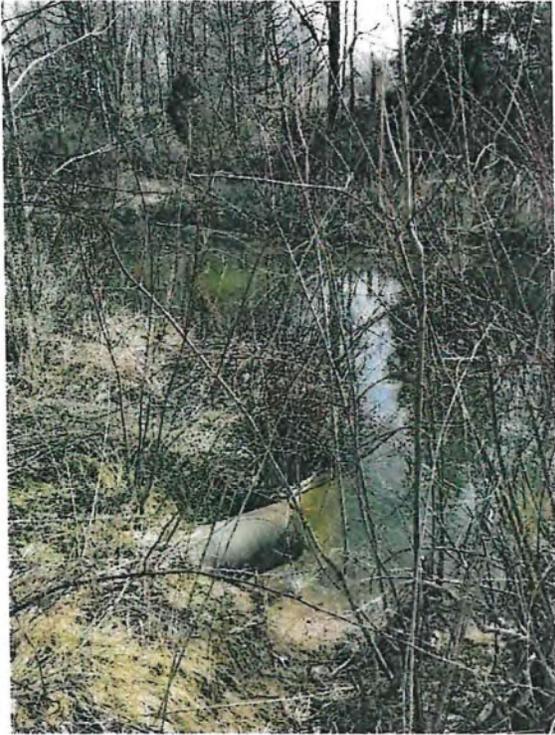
Lake Paterek outlet into Smith Creek (photo facing northeast).
